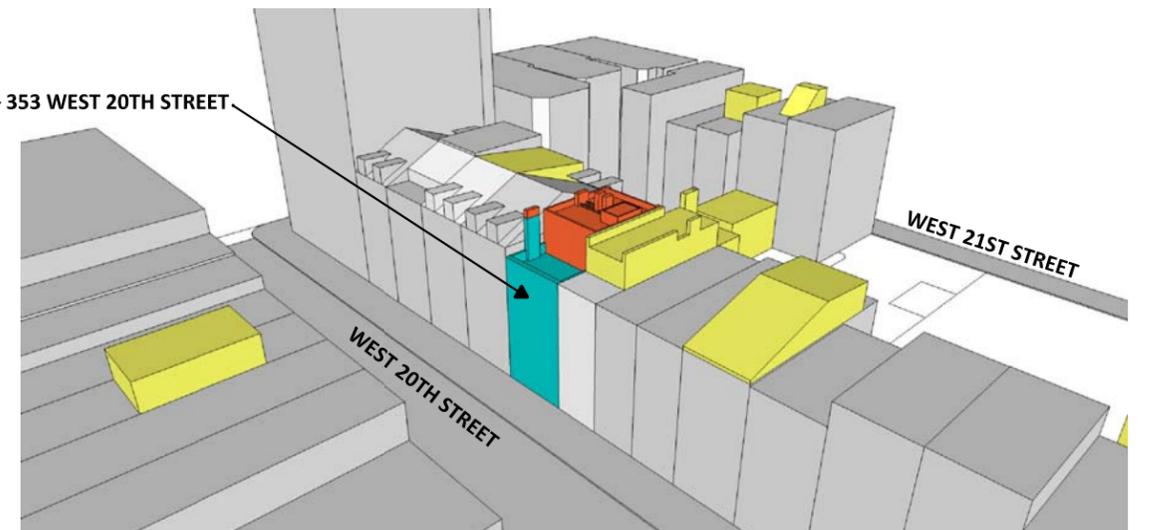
ZOOM-IN VIEW FROM PHOTO 1
